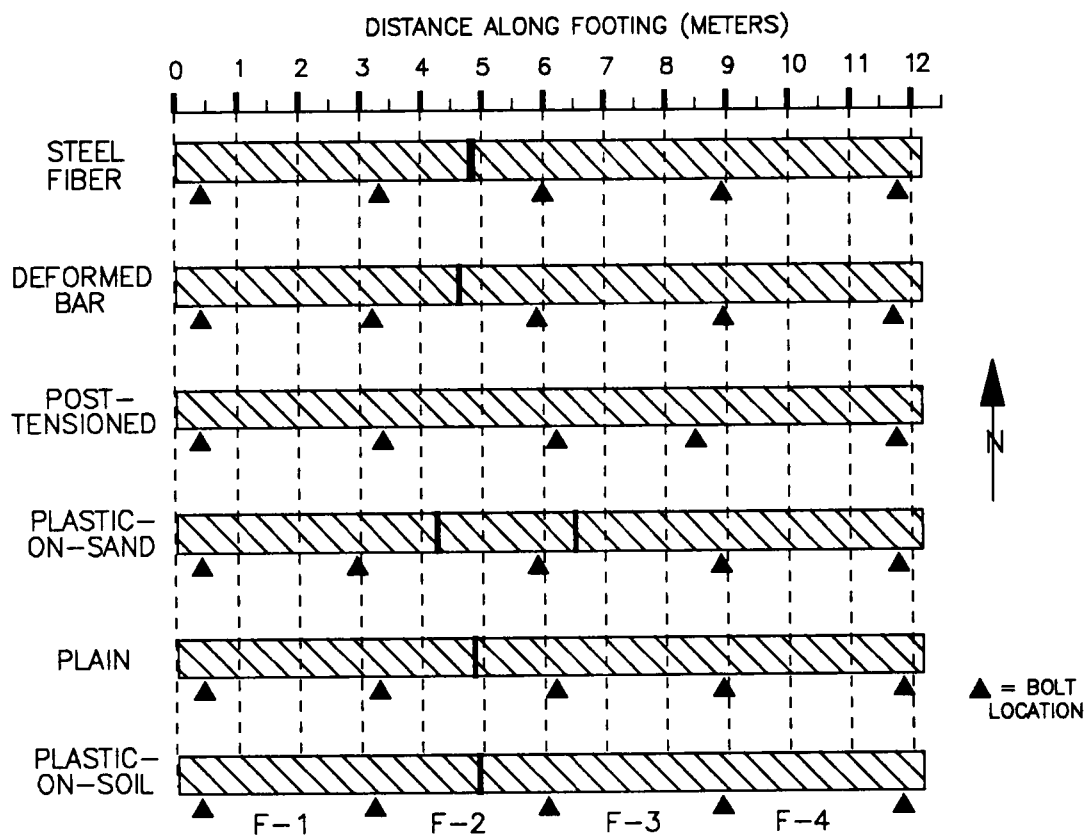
Day 90 Centerline Footing Crack - Extensometer Segment Location
